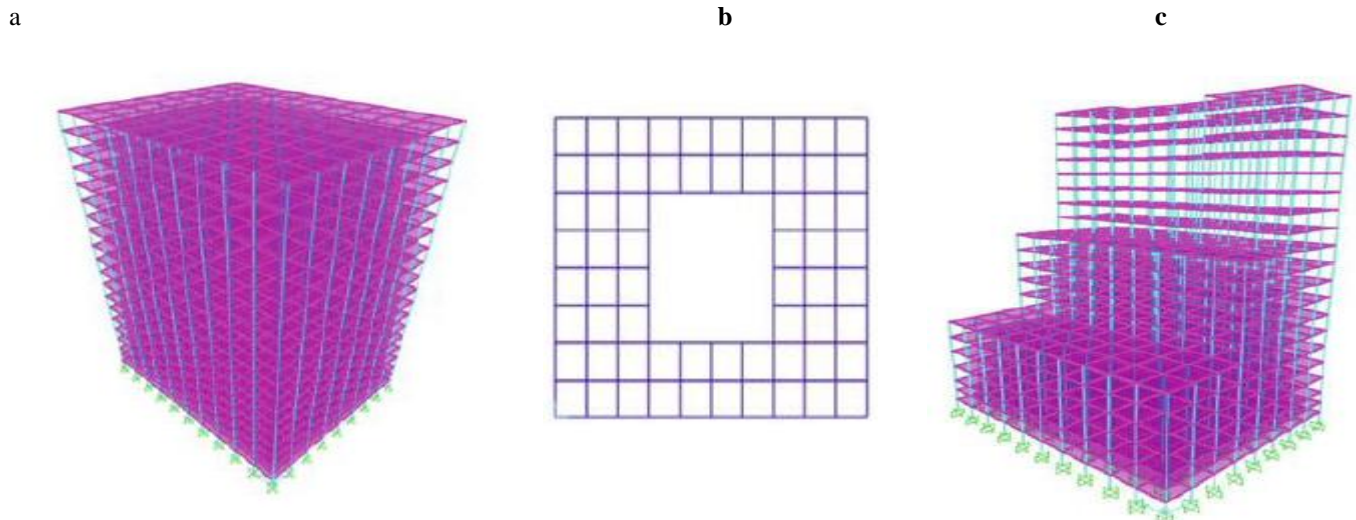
(a) Regular building with natrium. (b) Regular building plan with atrium & (c) Irregular Building with stepped elevation
